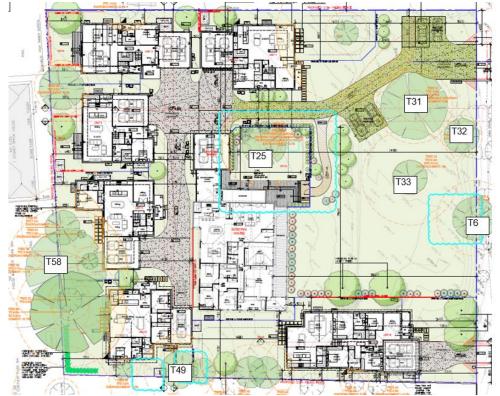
(above): Section 57 Amended Development Plans (retained trees relevant to subject assessment are labelled)
